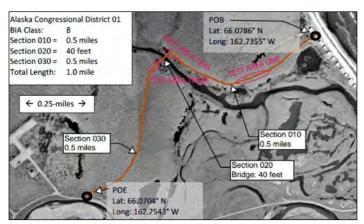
Engineering plans depicting proposed APE, Sections, and Test Areas 1-3.
